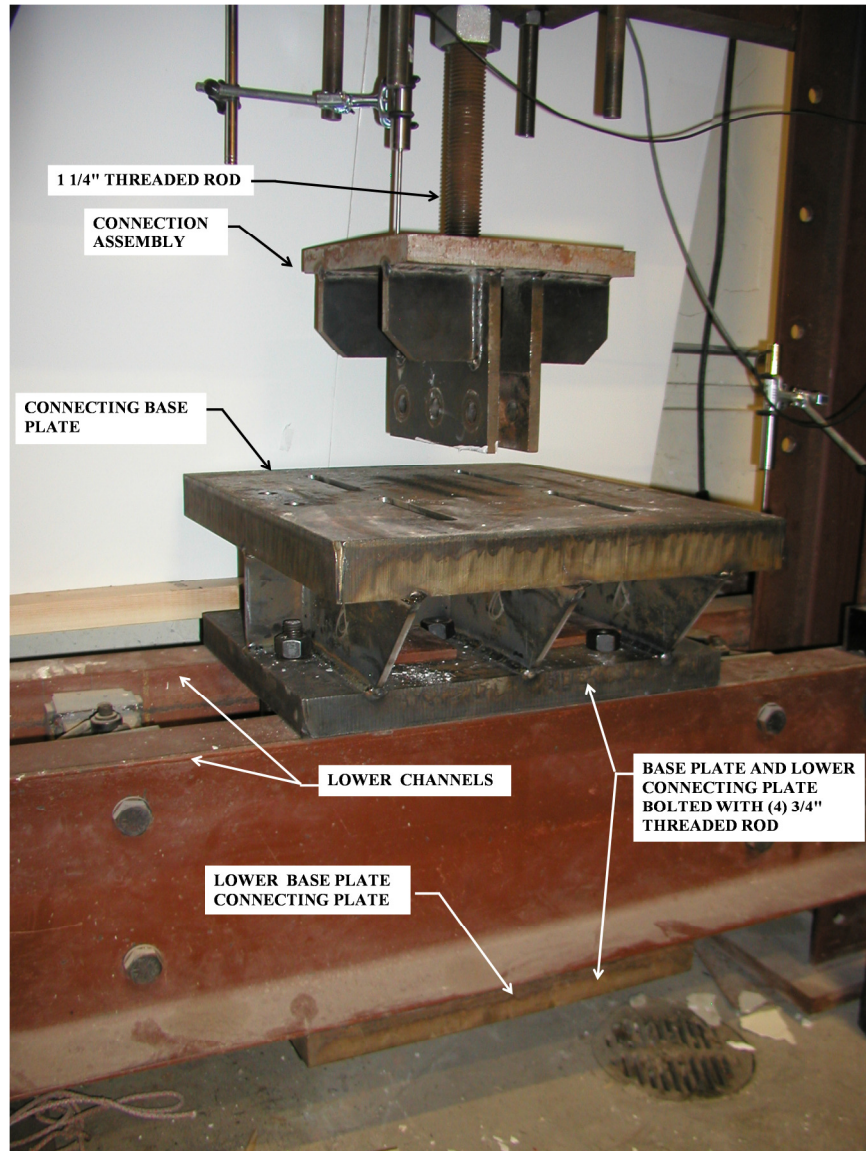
Base Plate Assembly and Connection Assembly.
